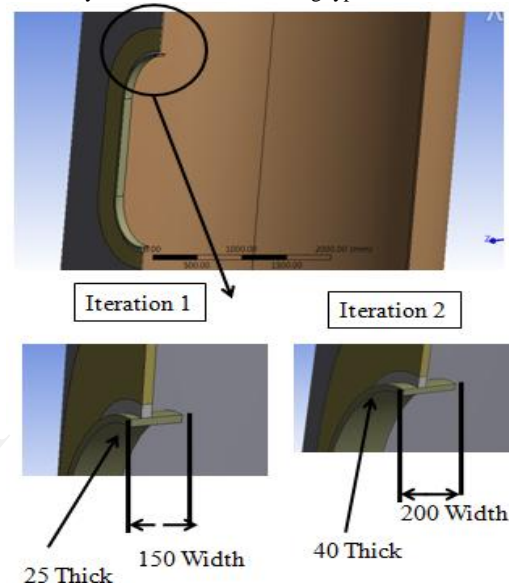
Geometry of bottom tower with ring type stiffener door frame
